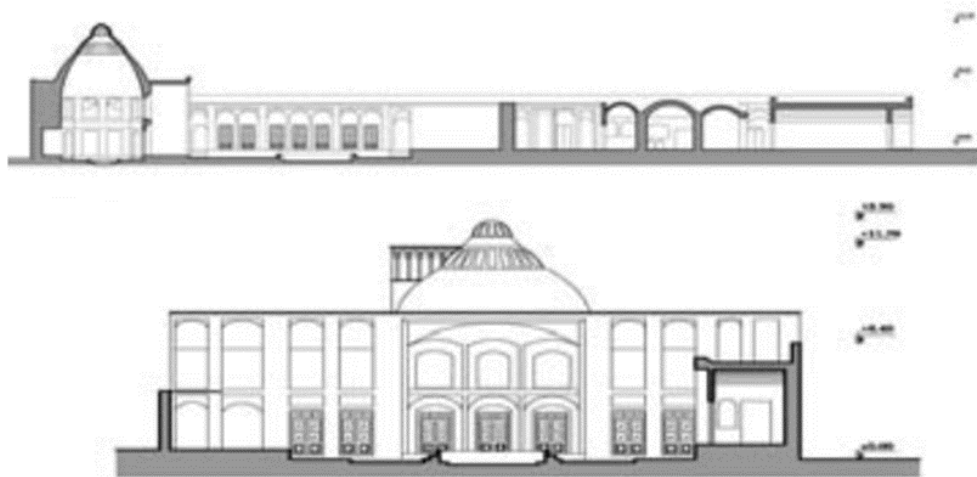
Section and Façade Design Example of Houses in Mehriz Village
